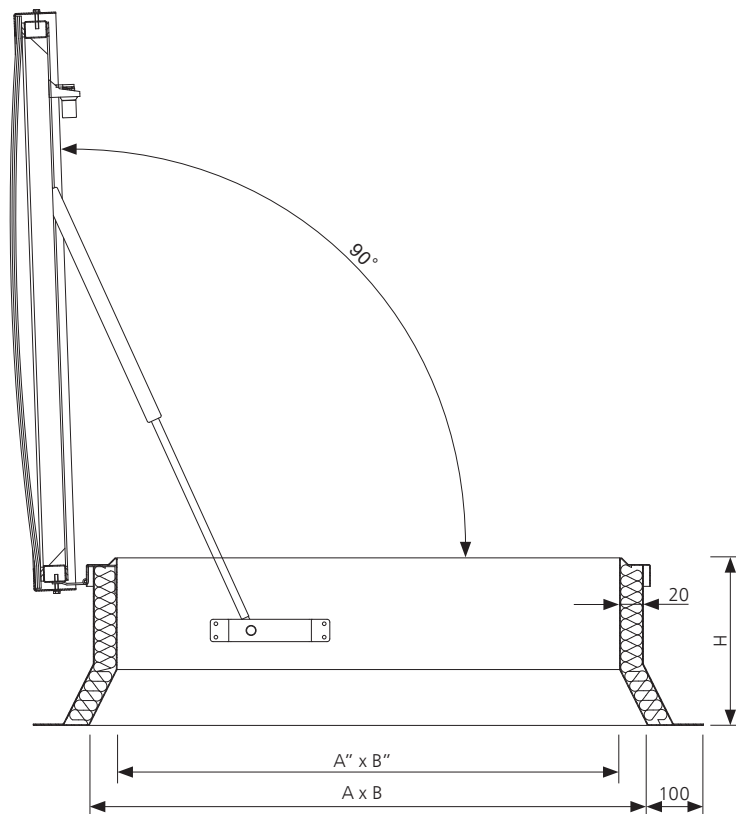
Section B-B of mcr PROLIGHT NG-A roof hatch in open position, dimensions in [mm]
